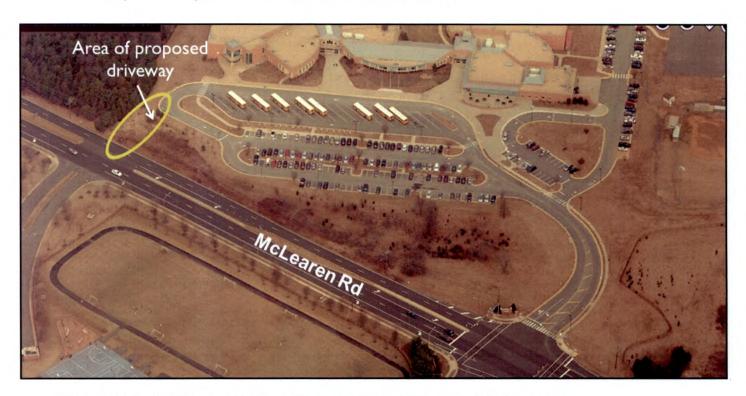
Aerial Photo of Site with Location of Proposed Driveway
